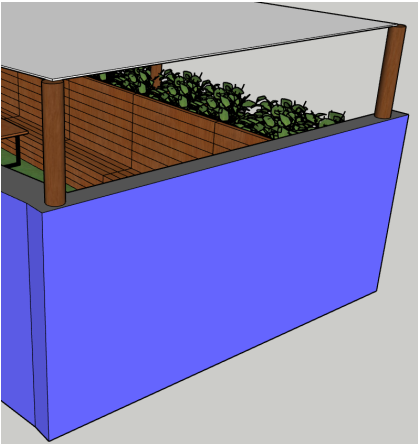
Wall Erected to Block off Air Conditioning Units and Pipes
